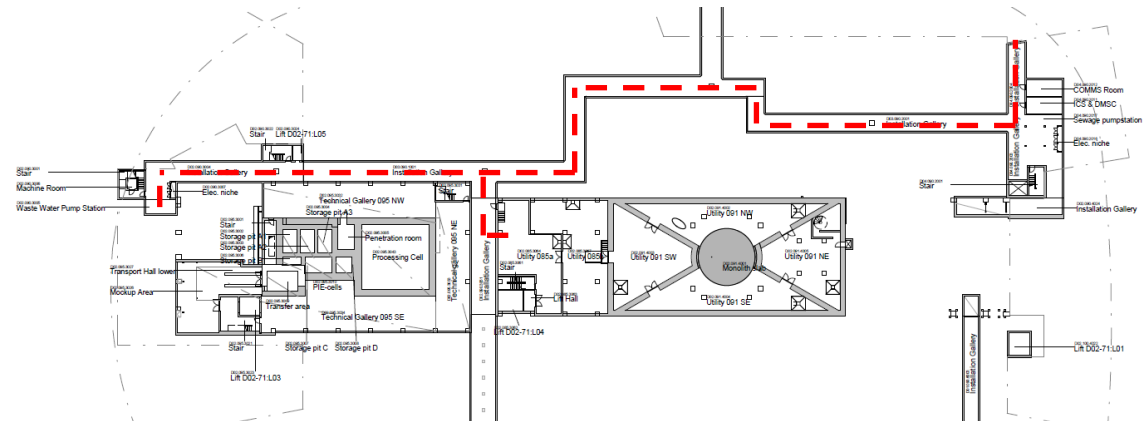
TSS cable routing in Installation gallery on level 090 in D02 building
